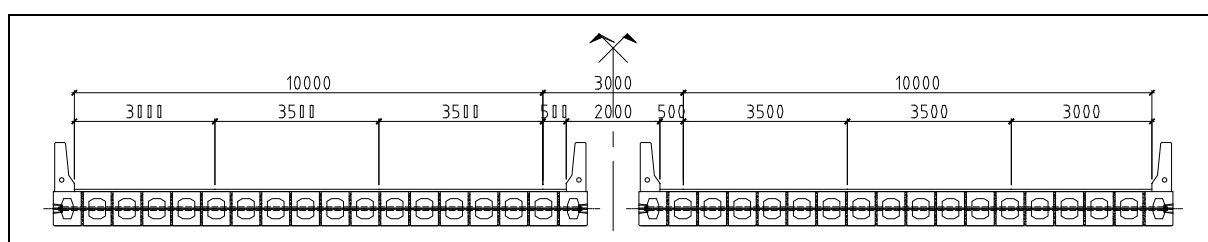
Typical Cross Section of Replacement Bridge
